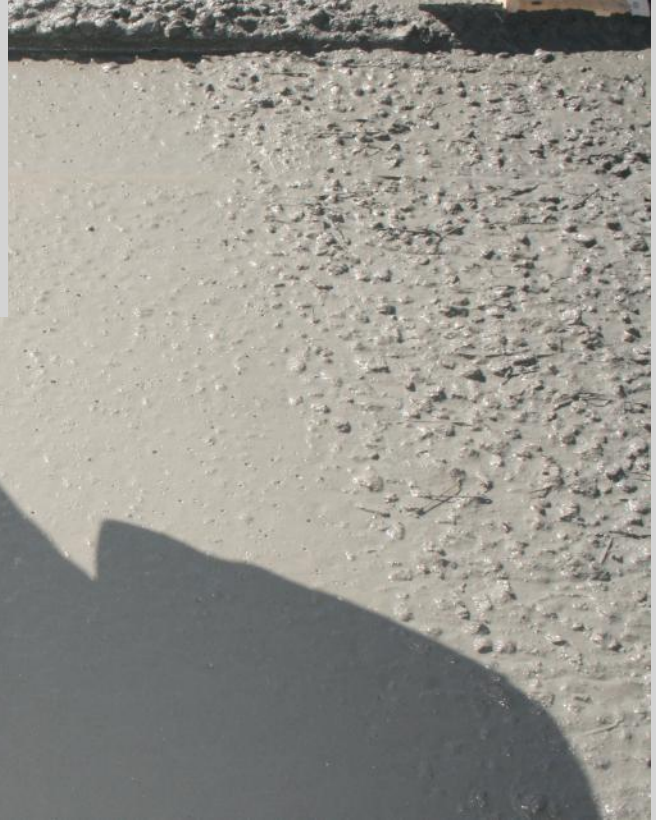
Surface finishing of SFRSCC using a screed bar.
